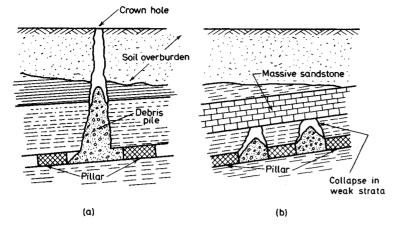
Subsidence due to collapse of cavities in mineworkings. (a) Weak strata over coal seam; (b) strong 'roof' over coal seam
